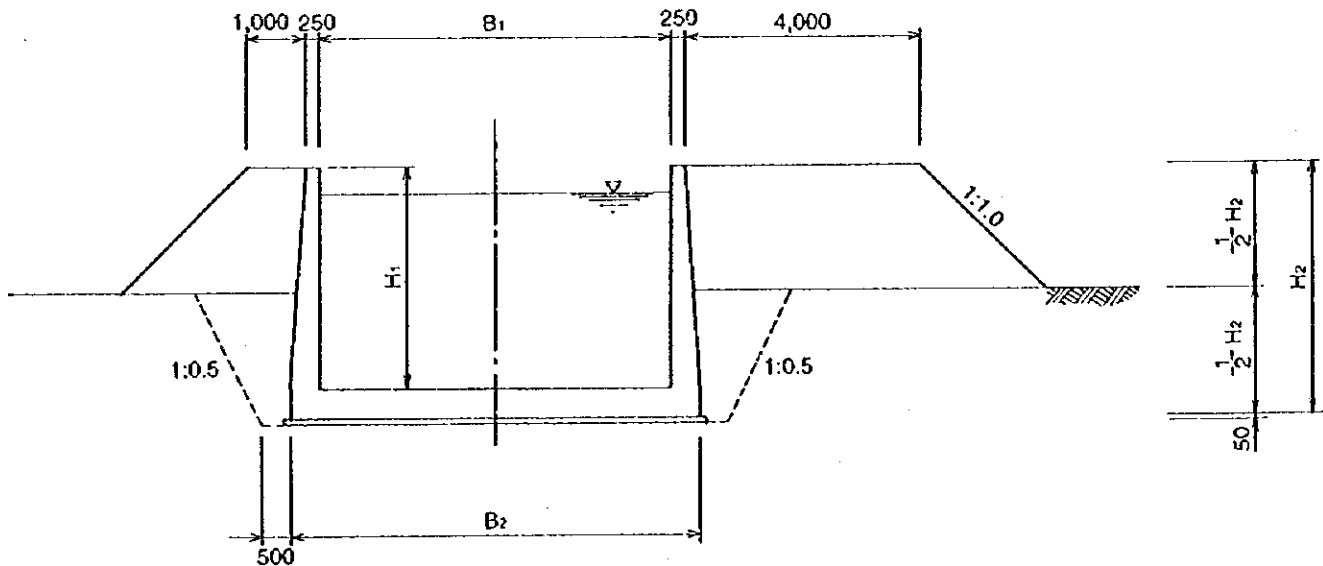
TYPICAL CROSS SECTION OF MAIN & LATERAL CANAL
